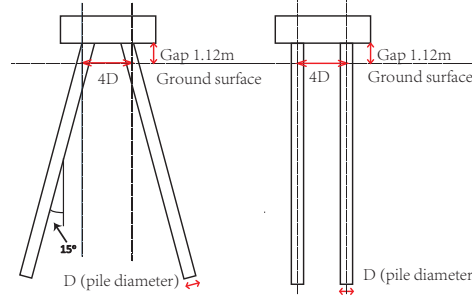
Spacing of piles in inclined pile and vertical pile groups
